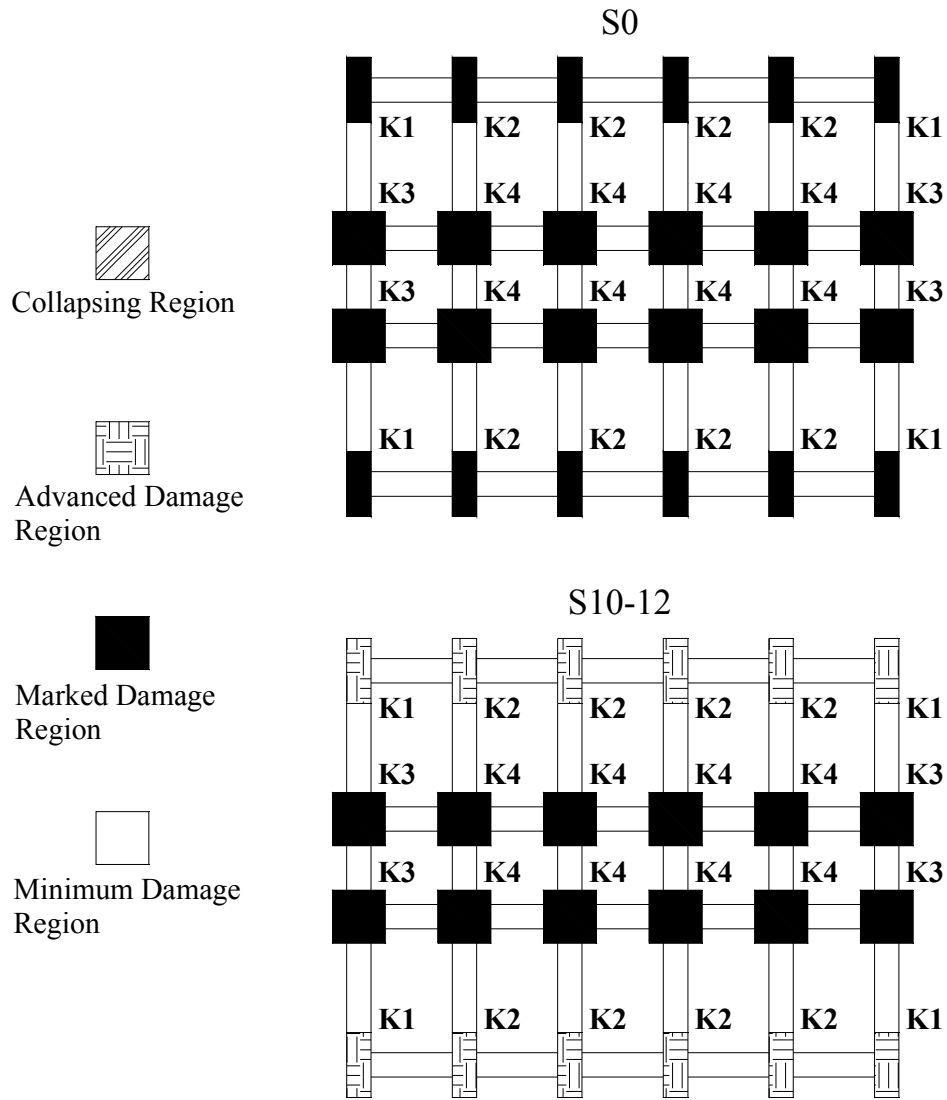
The view of damage levels of base columns of S0 ve S10-12 buildings on plan for BİNGÖL, 2003.
